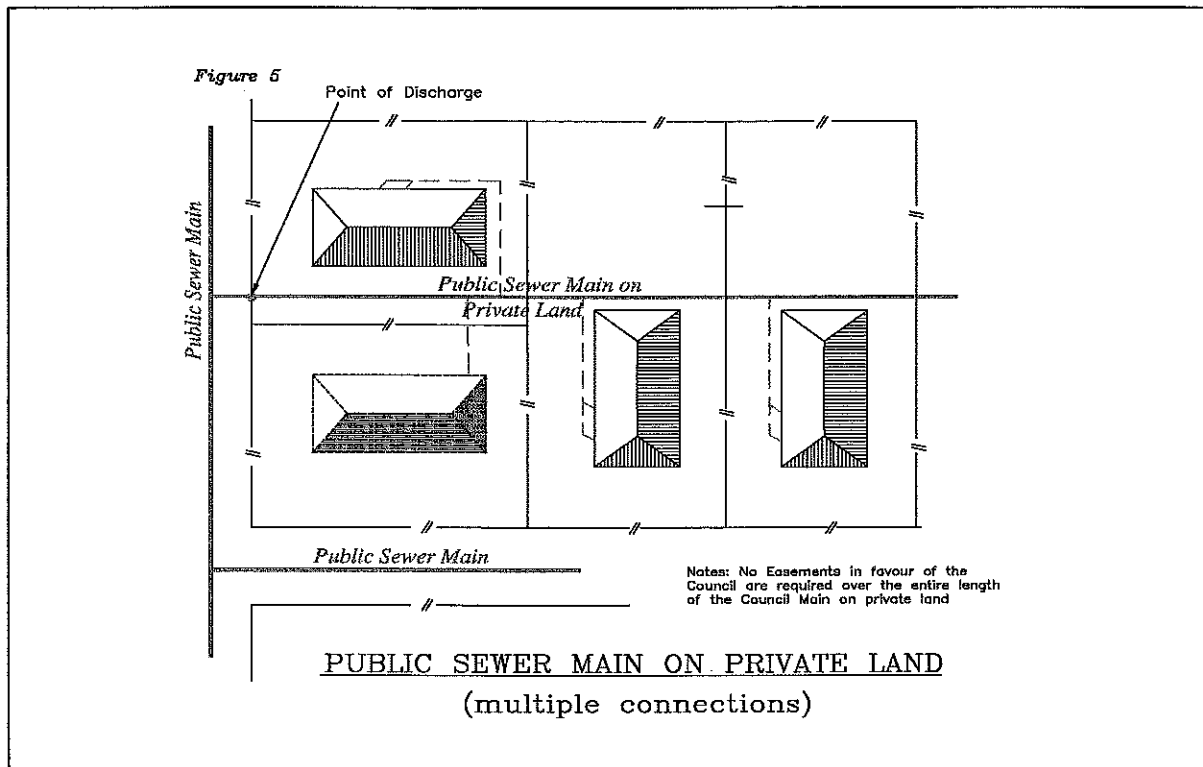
Typical layout at point of discharge – Public sewer main on private land – No easement required.
